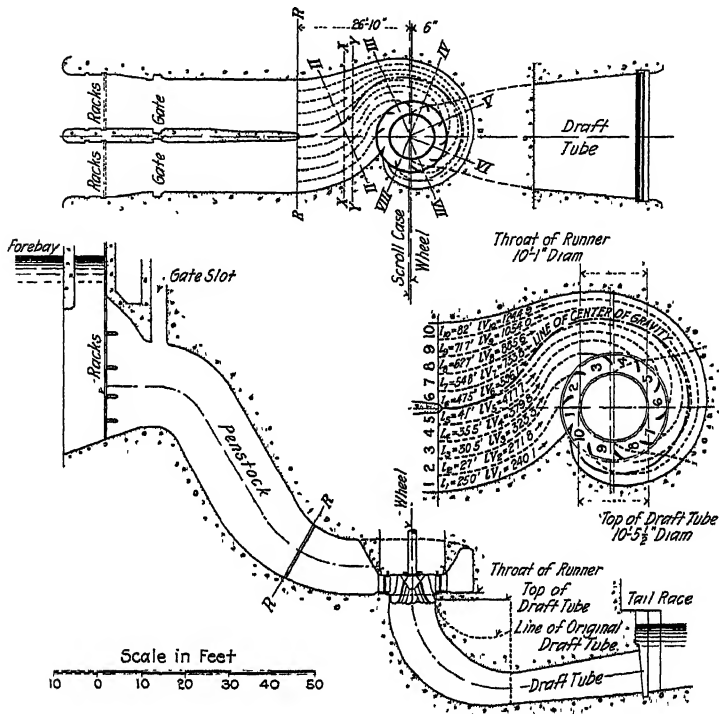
PLAN AND SECTIONAL ELEVATION OF INSTALLATION WHEREIN DRAFT TUBE CONSTITUTES LARGE PORTION OF WATERWAY
